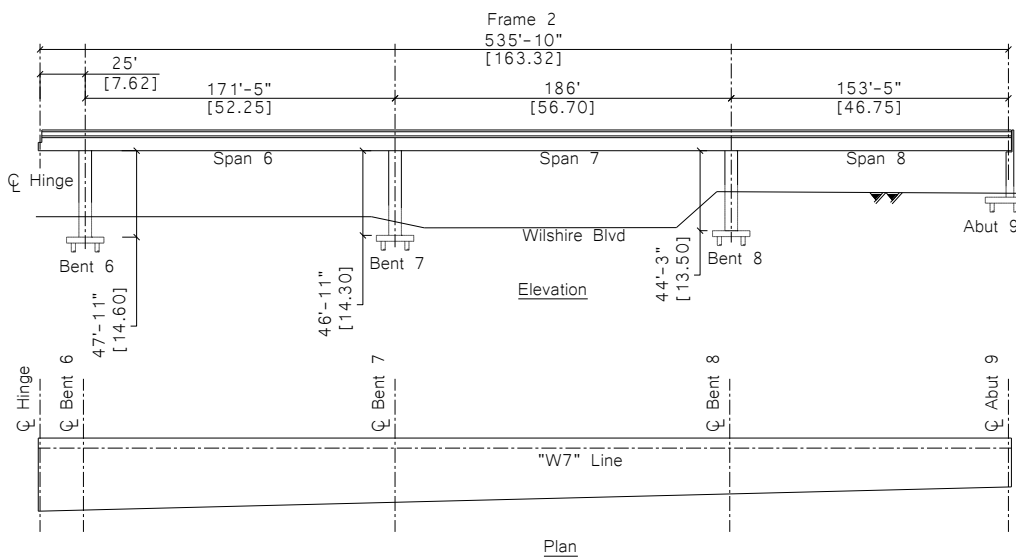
Elevation and plan views of Frame 2, Bridge 4
